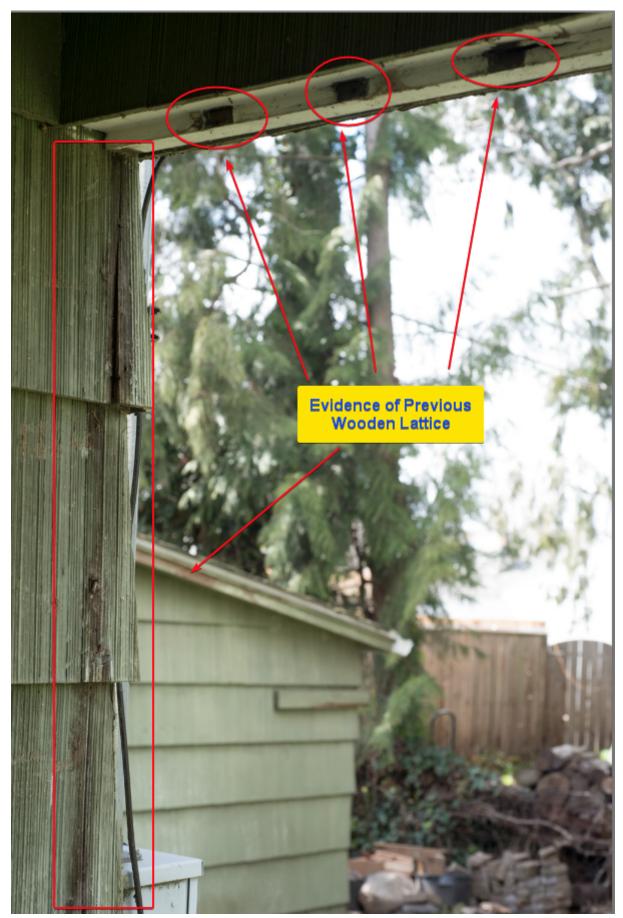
West Opening Of Front Porch Showing Previous Lattice
